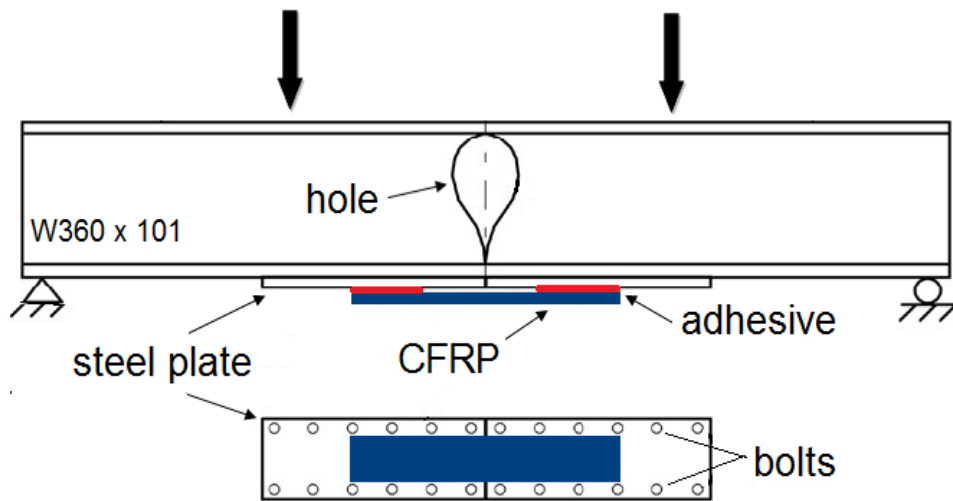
Effective bond length of CFRP strips bonded to fatigued steel bridge I-girders (Nozaka et al. 2005)
